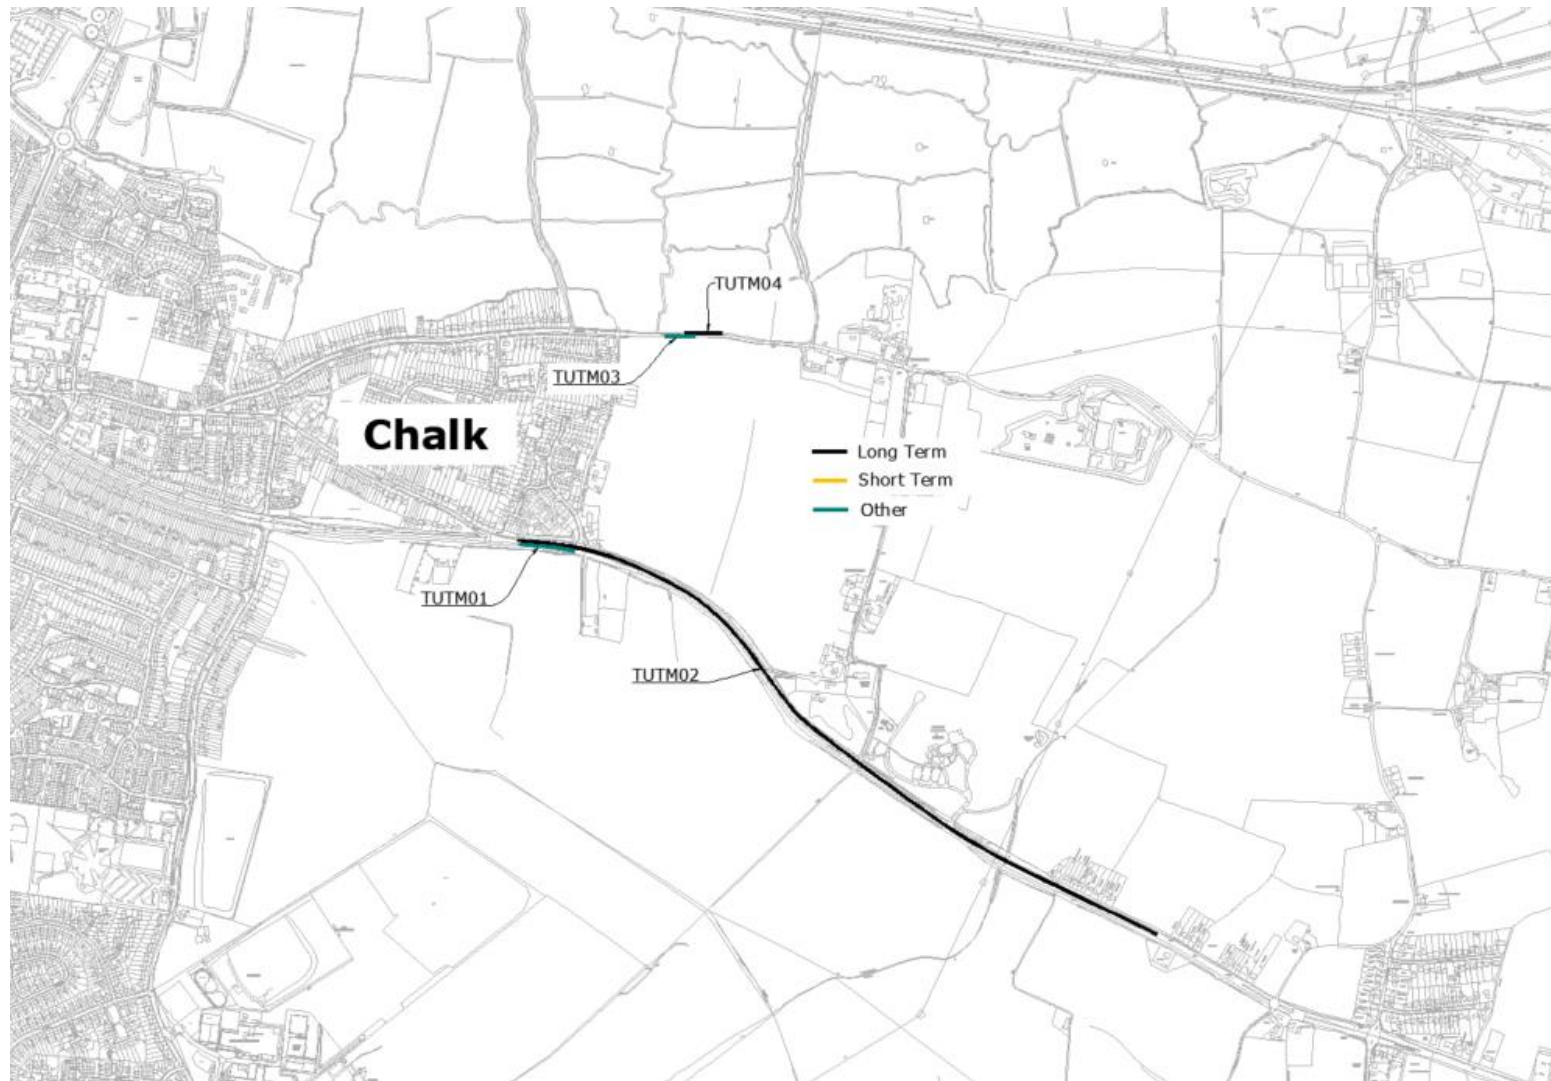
Tunnel traffic management measures location plan (2 of 2)
